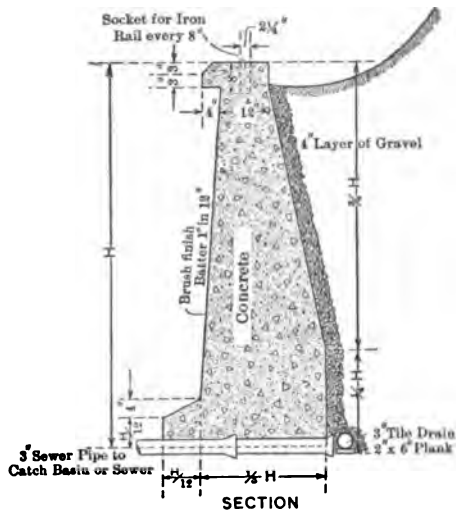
STANDARD RETAINING WALL, CITY OF SEATTLE.
